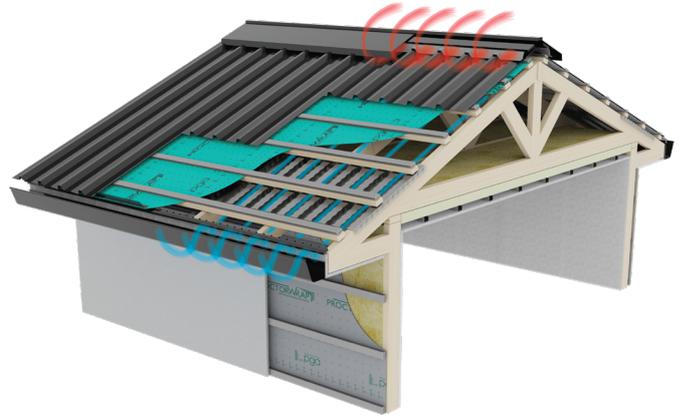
Sarking is installed draped over and perpendicular to the roof truss/rafters to permit safe drainage under the roof batten. The ProctorVent VB10 drainage batten is not required to be used in such installations.
